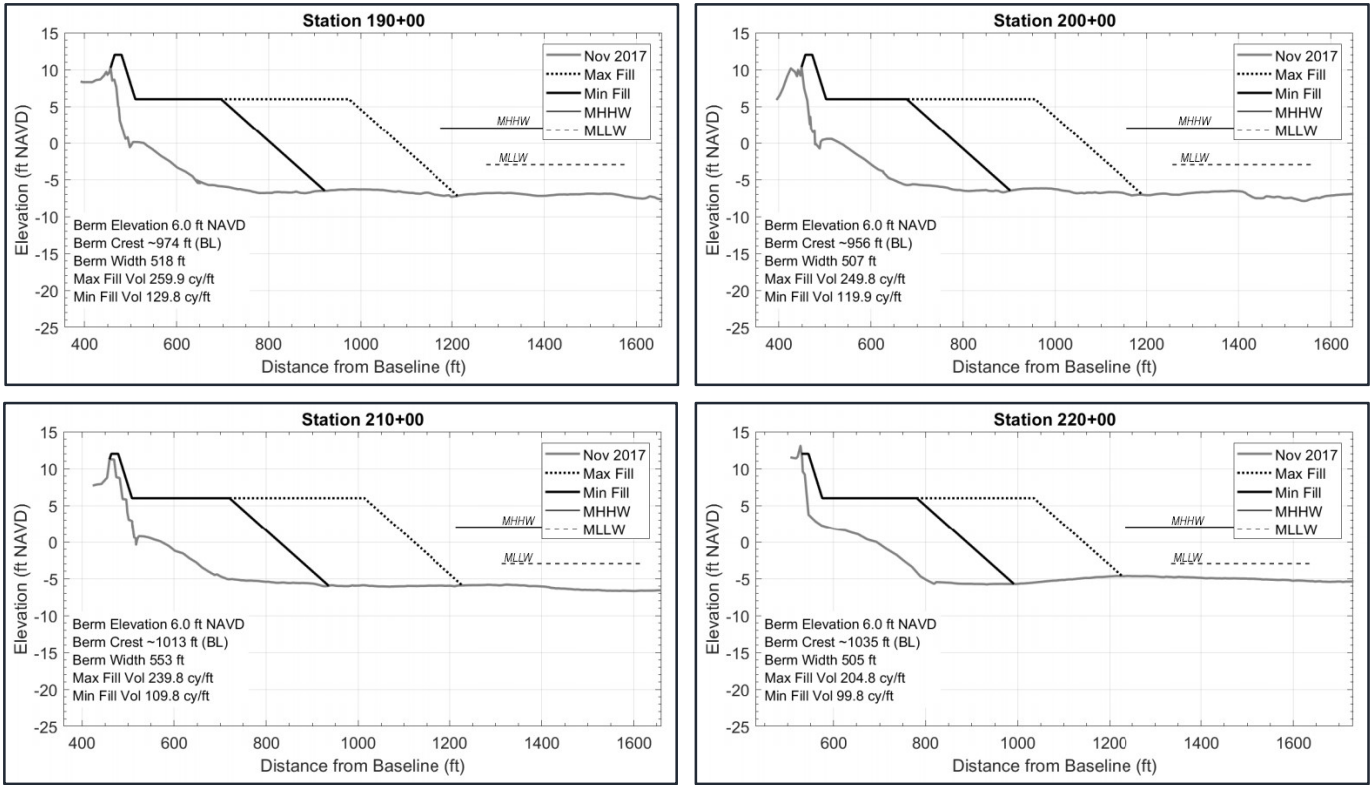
Additional proposed beach-fill sections showing the anticipated minimum and maximum berm widths along the central portion of Reach “B” and the proposed artificial dune to be placed seaward of the existing seaward crest of the seawall. Note highly eroded condition of the beach in October 2017 which provides no dry-sand habitat at these stations.
